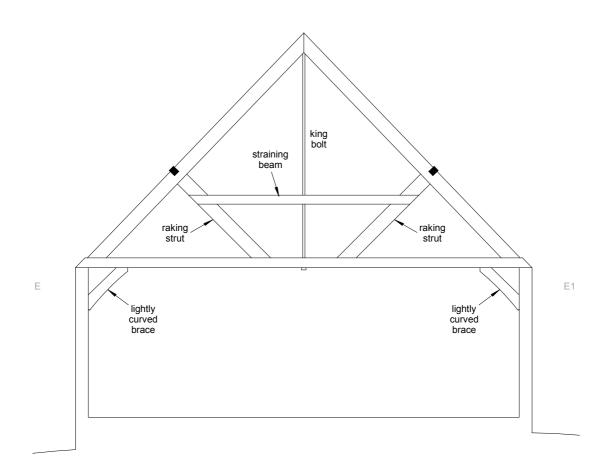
Structure 10, 1898-1918 milking shed cross-section of truss E.
